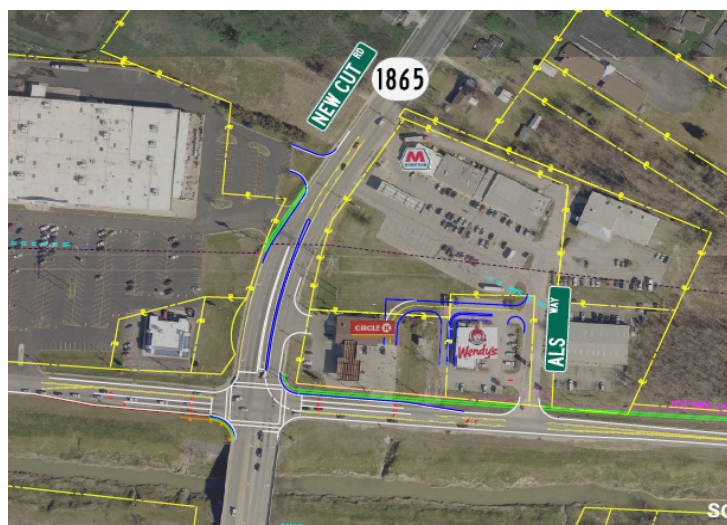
Access Management at Outer Loop/New Cut Road Intersection
